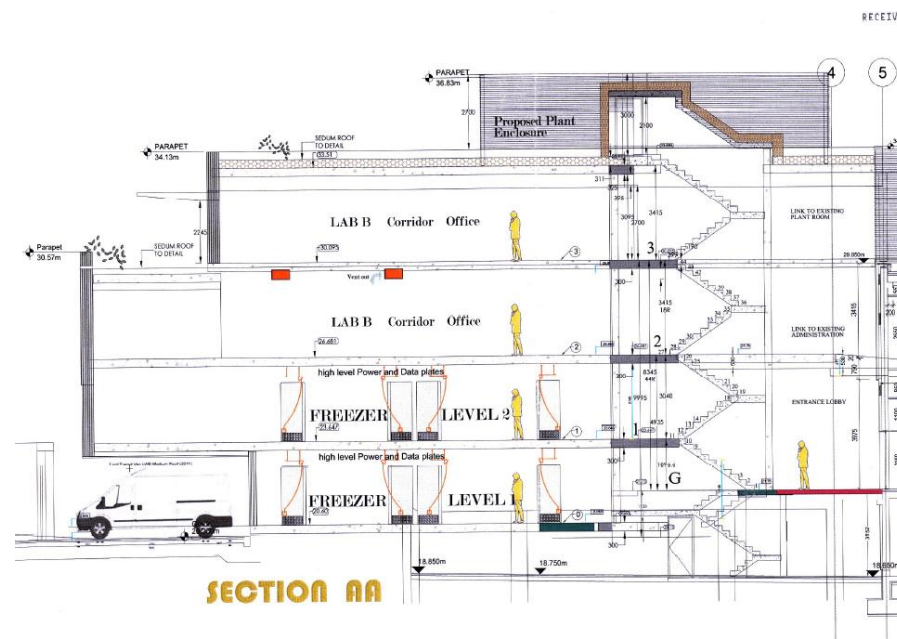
extract from 'Section AA' from application drawings by Eoin Condon Architect
